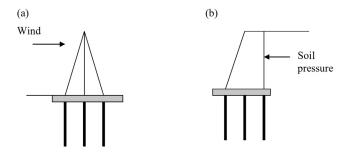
Laterally loaded piles. (a) Transmissin tower. (b) Earth retaining structure.
